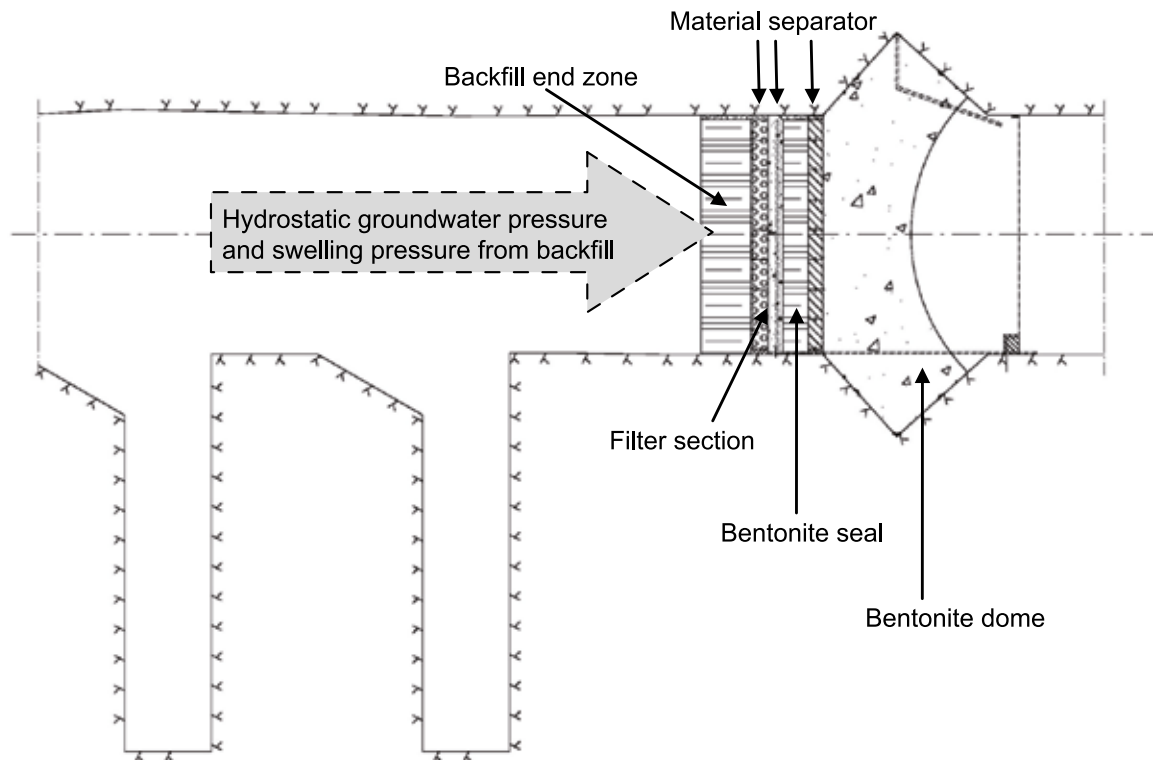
Reference design of dome-shaped plug for a deposition tunnel. The concrete dome is made of unreinforced low-pH concrete.
